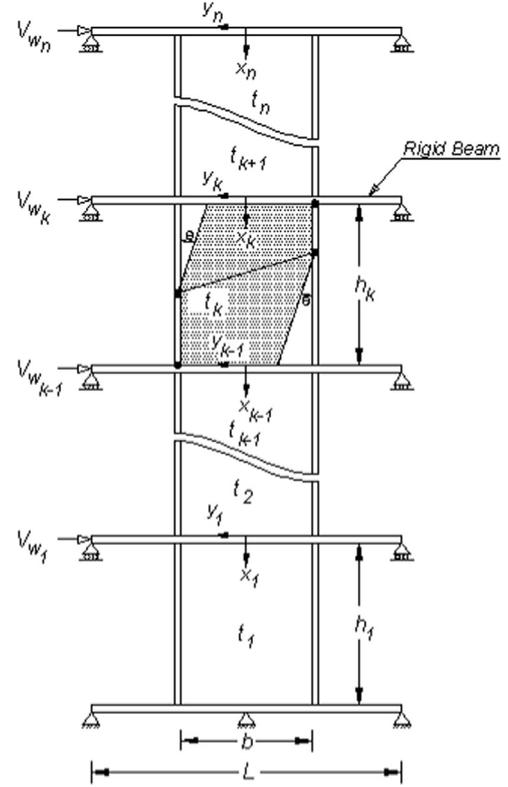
A semi-supported steel shear wall with rigid beams under lateral forces.
